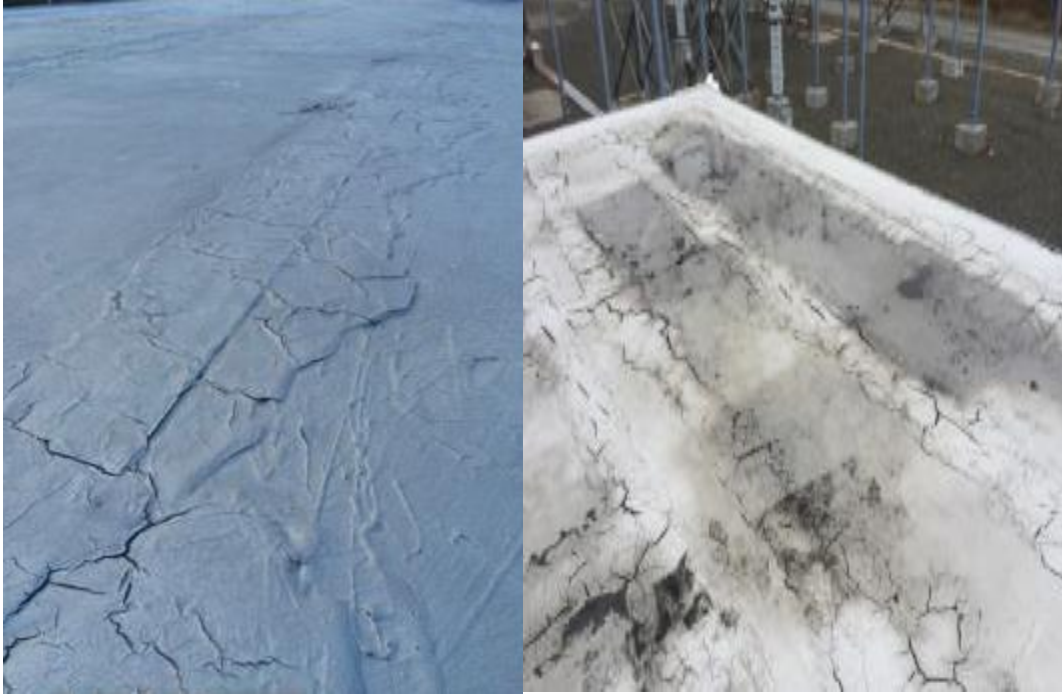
Terminal Station Control Buildings (Come By Chance and Sunnyside) showing cracking and deterioration of the roof membrane systems.
